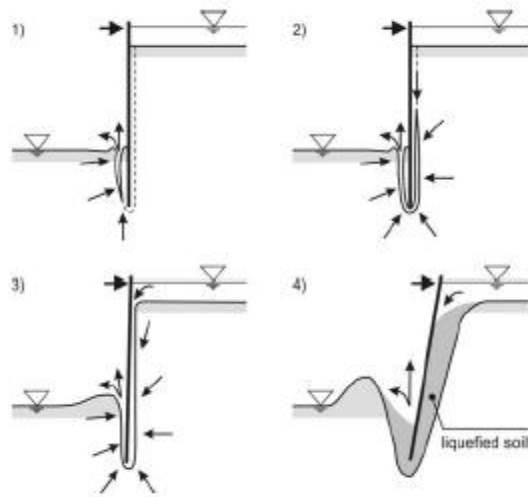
Piping on a sheet pile wall: 1) initiation and first deterioration, 2) regressive erosion, 3) formation of flow channel, 4) liquefaction and collapse according to EAU (2004) (Wudtke 2008)
